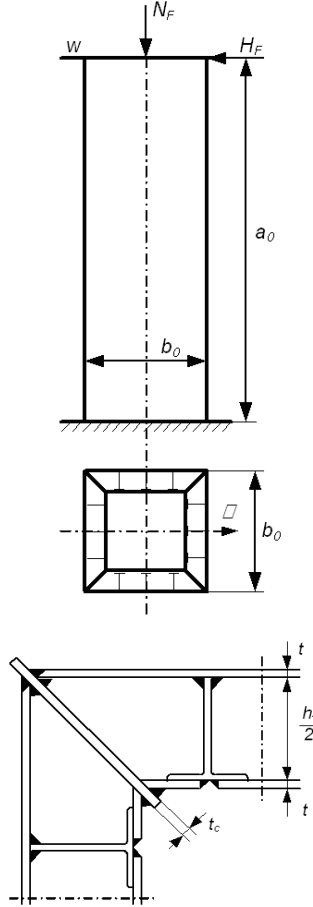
A cantilever stub-column of square box section with cellular side plates and the welded corner
